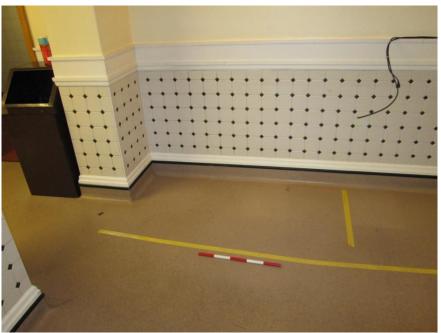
Area of Test Pit 1 pre-excavation, view to north (scale 0.5m)
